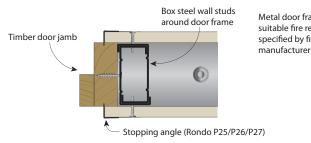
Timber Door Jamb - Plan View With stopping angle
